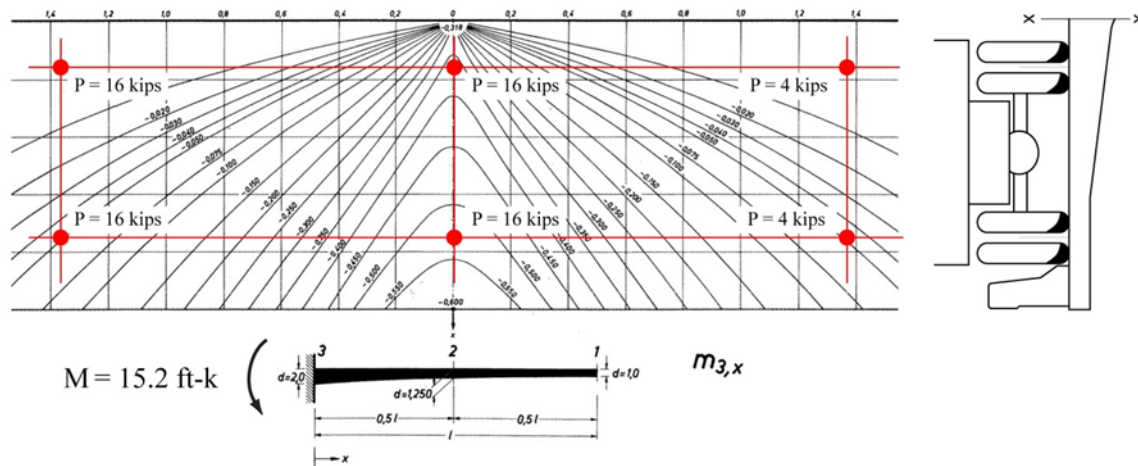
Loaded Influence Surface for the Cantilever Wing.
